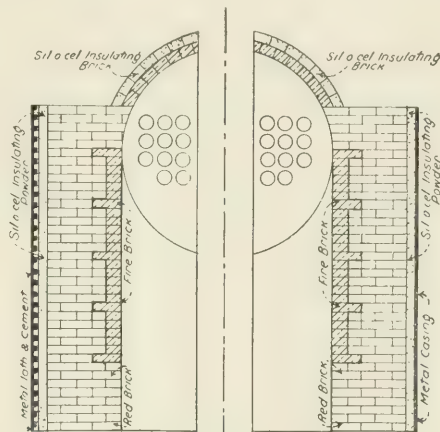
FIG. VII—SIL-O-CEL INSULATING POWDER AND METAL LATH CONSTRUCTION APPLIED TO BOILER SETTING
